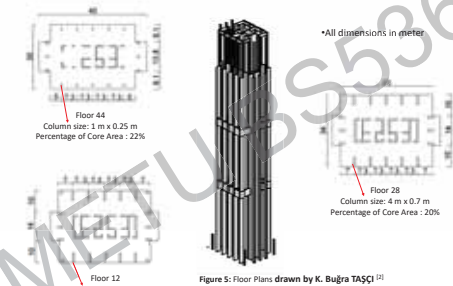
Floor Plans drawn by K. Buğra Taşçı ^[2]
